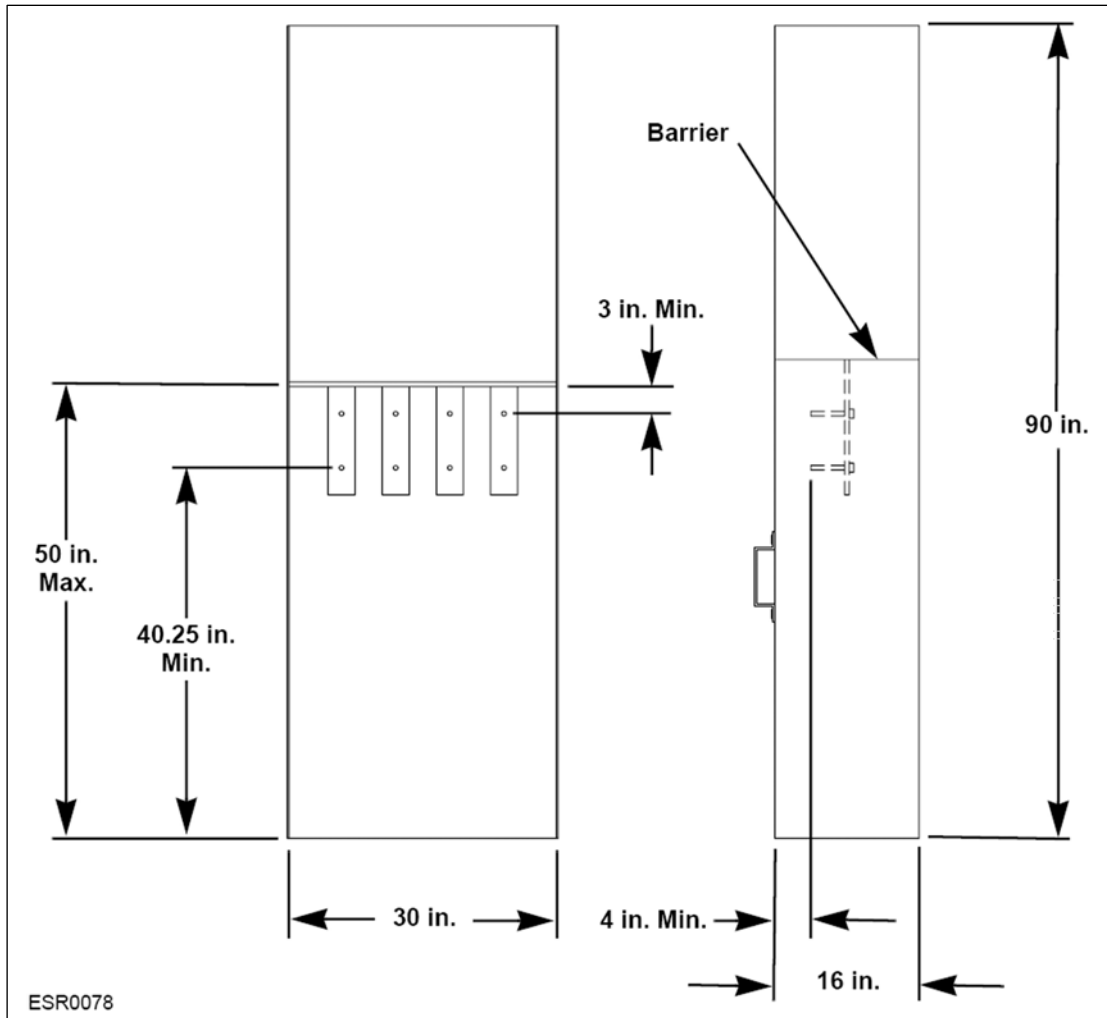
Load Section of an Indoor Switchboard (EUSERC 327)
